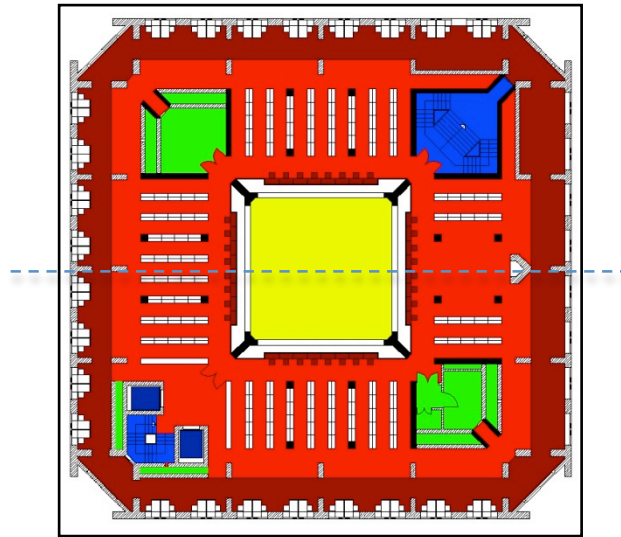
Exeter Library, Third Floor Plan (Drawn by Author)
